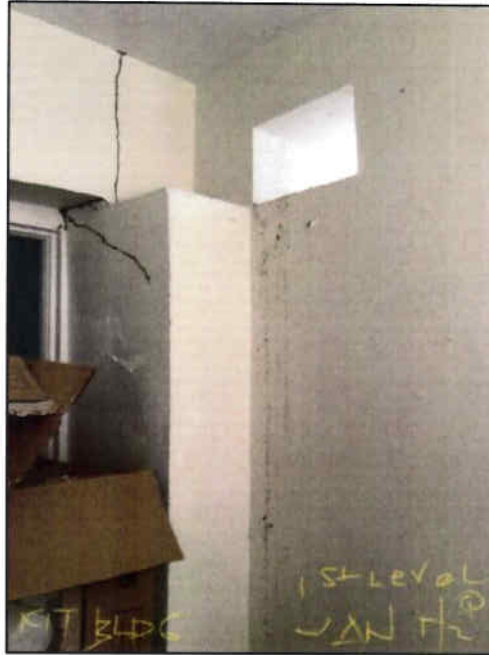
Detail of Termite Trail in Ground Floor, Kitchen. Taken 11/7/2017.
